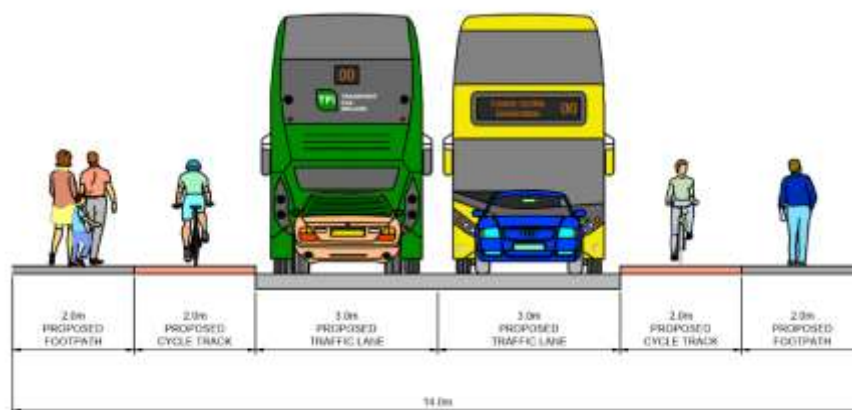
Typical Traffic Management Cross Section (C-C)
